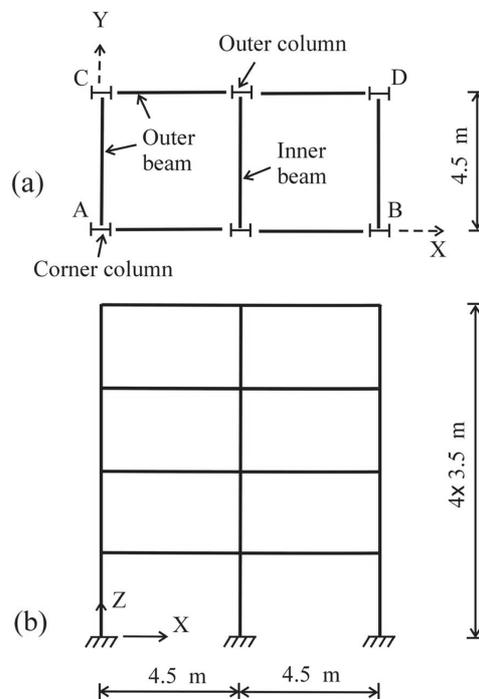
Four-storey 52-member space frame: (a) plan, (b) side view
